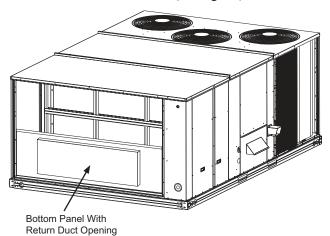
Install Bottom Panel with Horizontal Return Duct Opening
